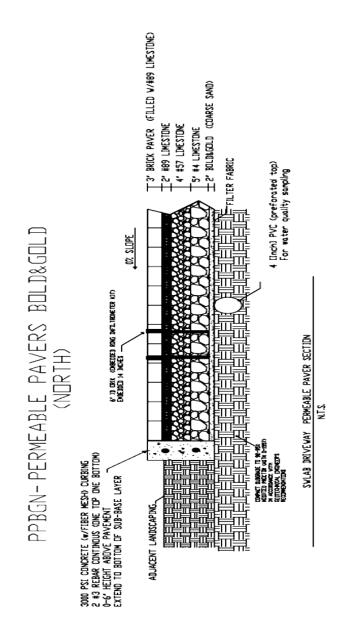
Cross-sectional view of Permeable Pavers Bold & Gold (PPBG)
